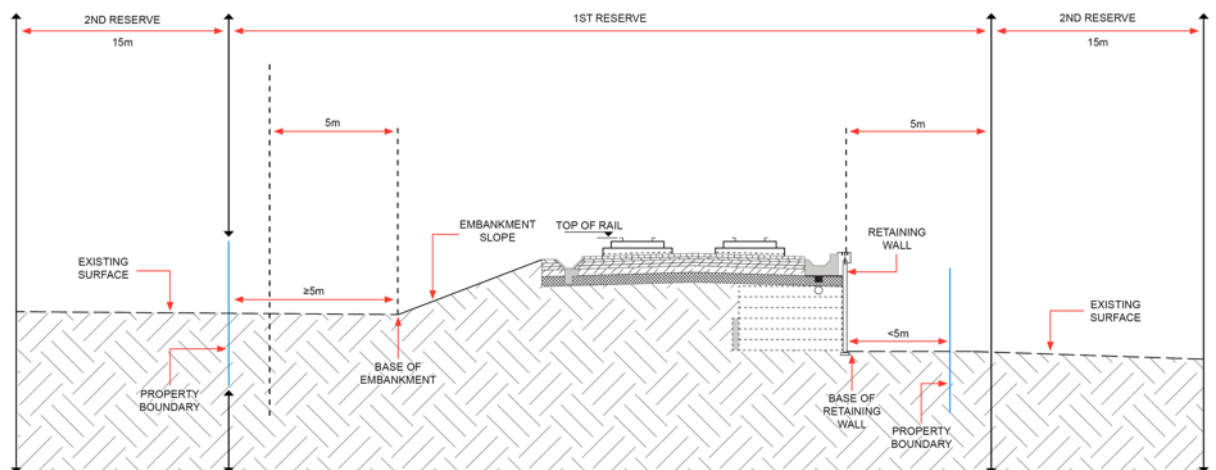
Section of embankment/retaining wall – protection reserves.
